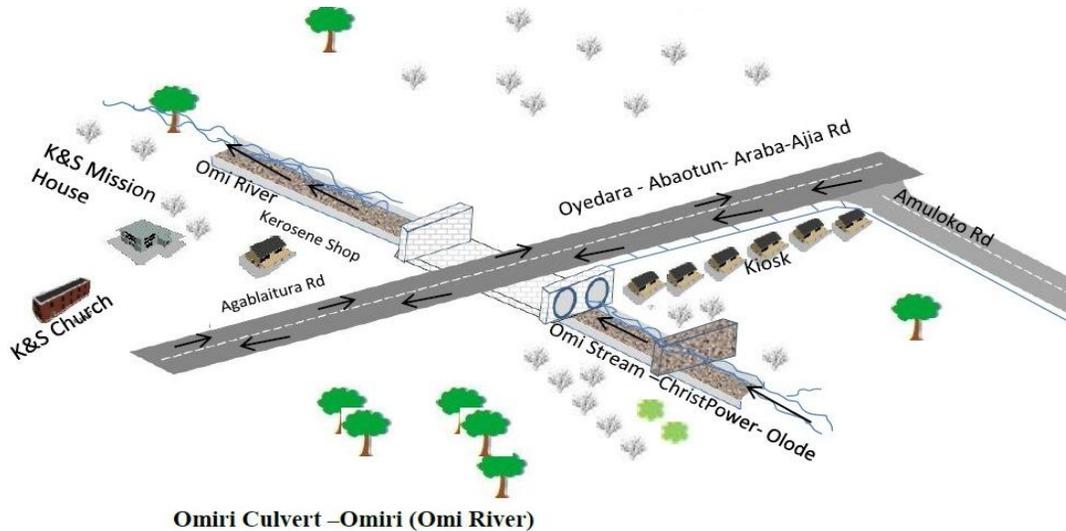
Omiri Culvert – Omiran (Omi River) Schematic Layout
